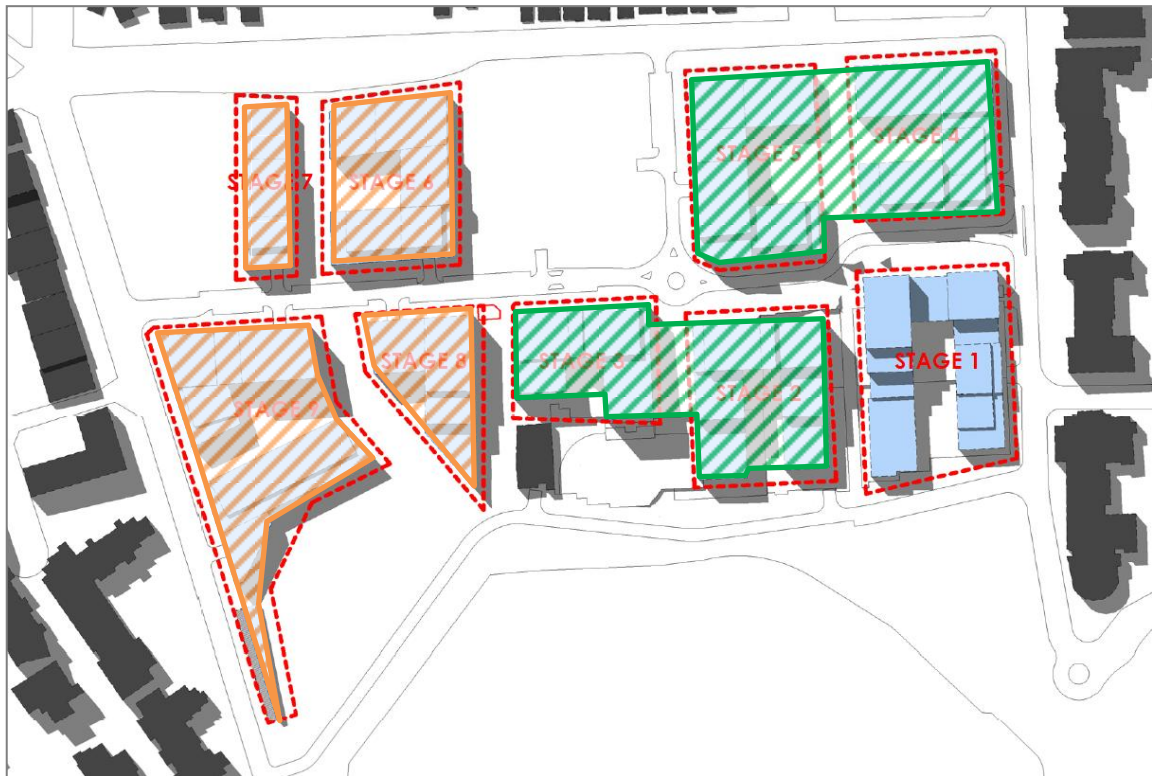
Plan demonstrating the proposed maximum layout of the basement parking levels. The basement parking levels of Stages 2 to 9 inclusive are also proposed to comprise the internal portion of the 'u-shaped' buildings. Stages 2 and 3 are also proposed to share a basement parking level as depicted in green. Stages 4 and 5 are also proposed to share a basement parking level as depicted in green. The basement parking levels of Stage 1 are approved subject to MP09_0219 and comprise the internal portion of the 'u-shaped' building.
